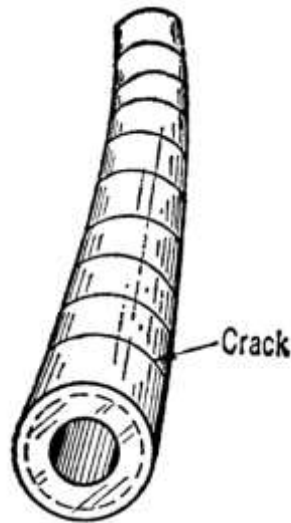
Cracked Precast Reinforced Concrete Piles from Yachiyo Bridge during the 1964 Niigata Earthquake (Fukuoka, 1966)
